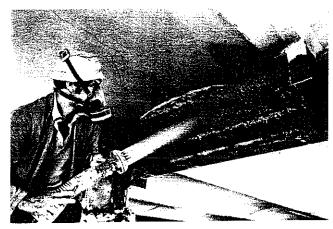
a. Fire insulation of steel girder by sprayed mineral wool
